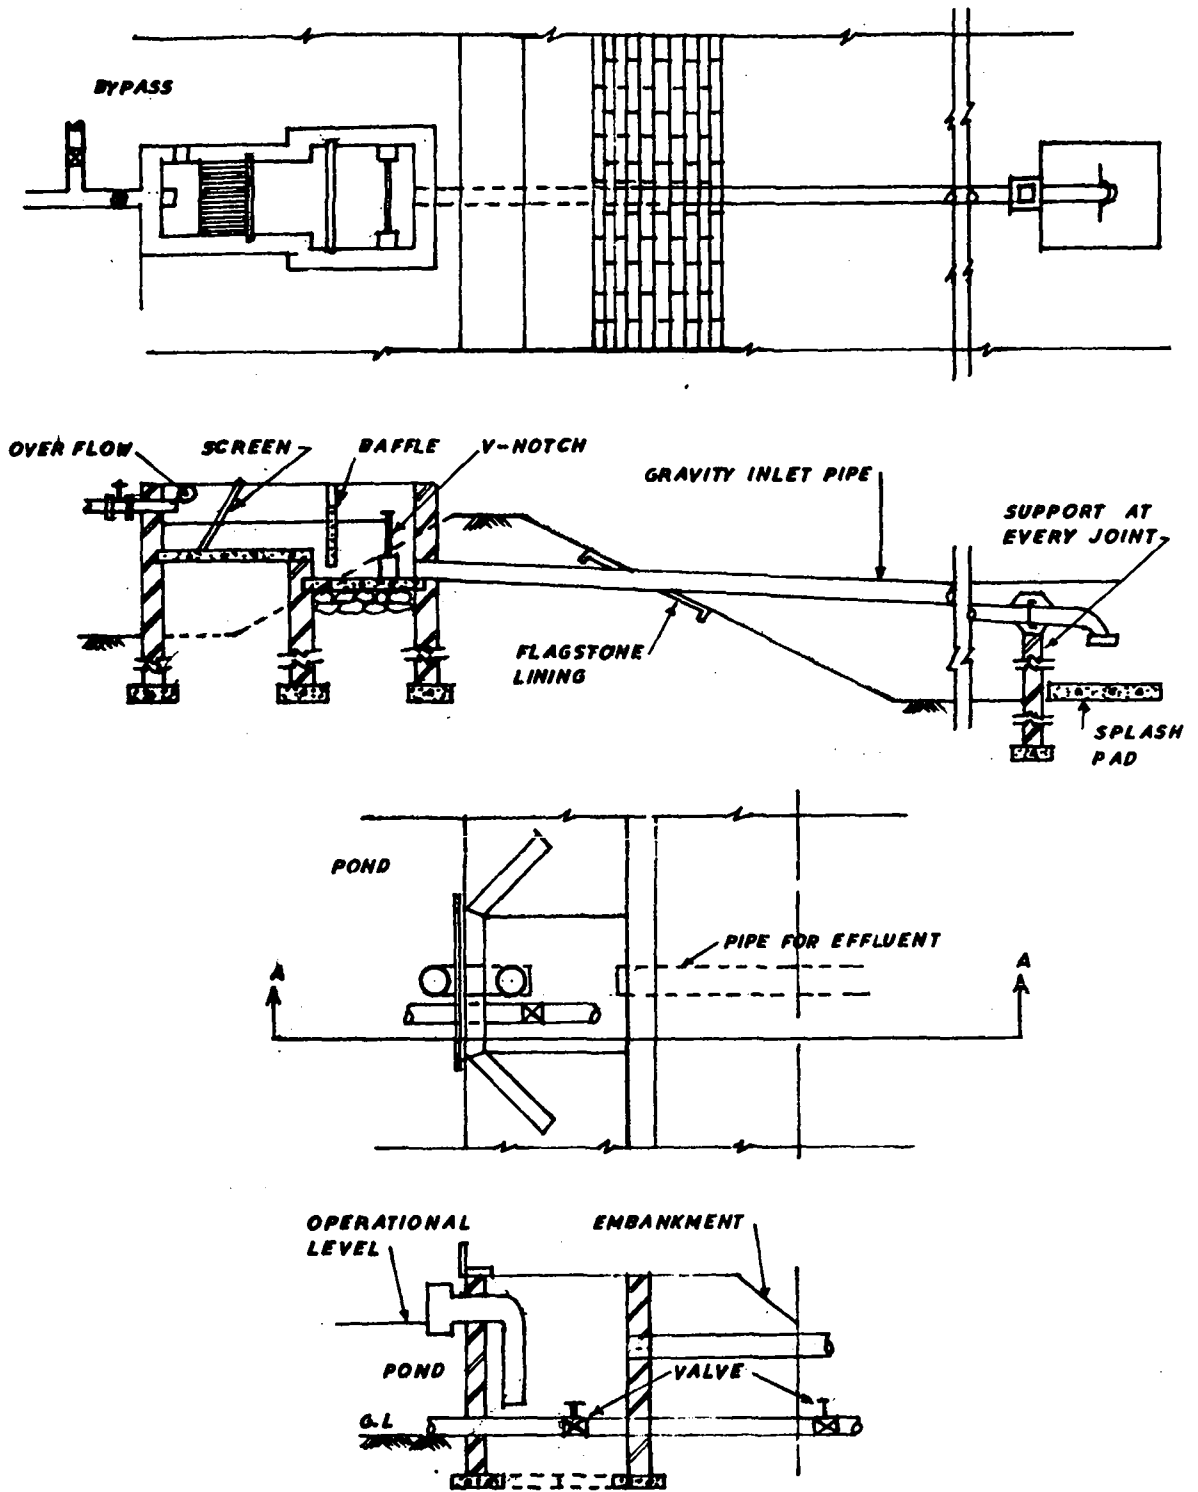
TYPICAL DETAILS OF INLET AND OUTLET CHAMBER
